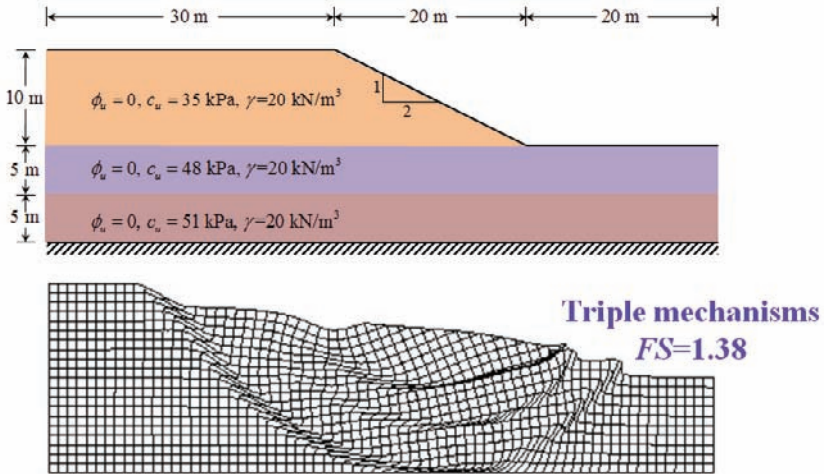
Deformed mesh at failure demonstrating a non-circular failure mechanism.
